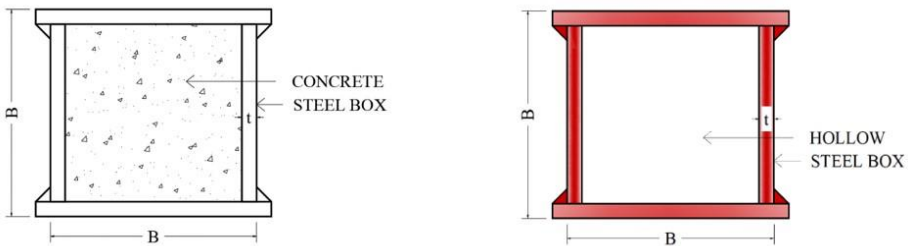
Cross Section of Concrete Filled and hollow steel box column.
